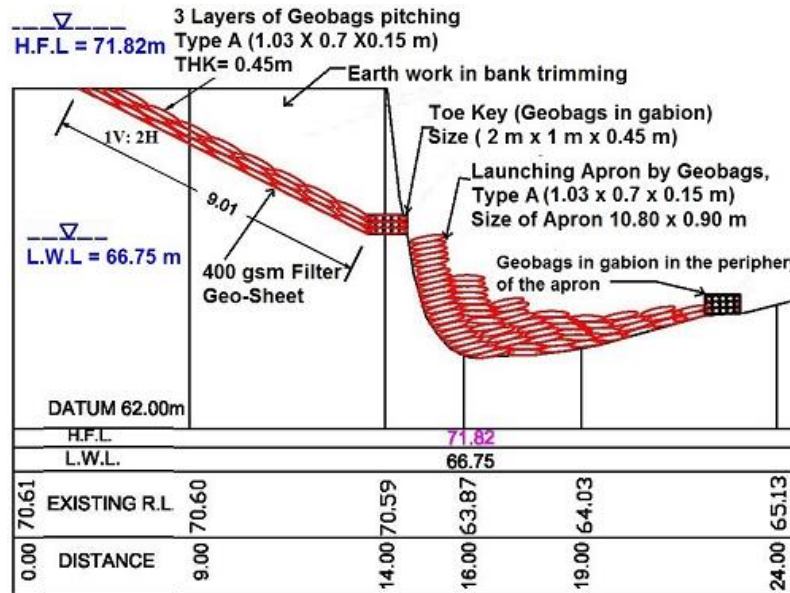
Cross section of launching apron and bank pitching work at right bank
